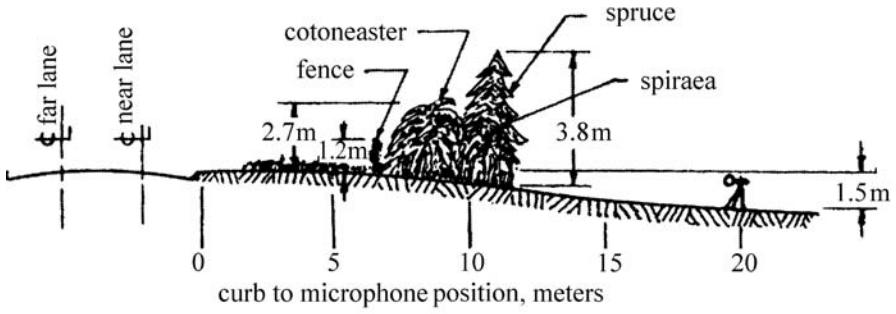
Site B has medium-height planting, a woven board fence and a downward sloping ground profile from the street to the residence (Cook and van Haverbeke 1972)
